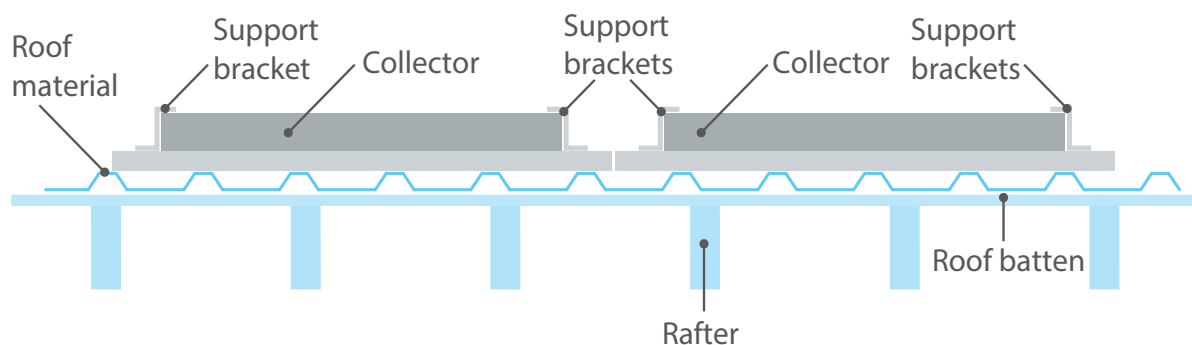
Side View Of High-Wind Mounting On A Metal Roof
